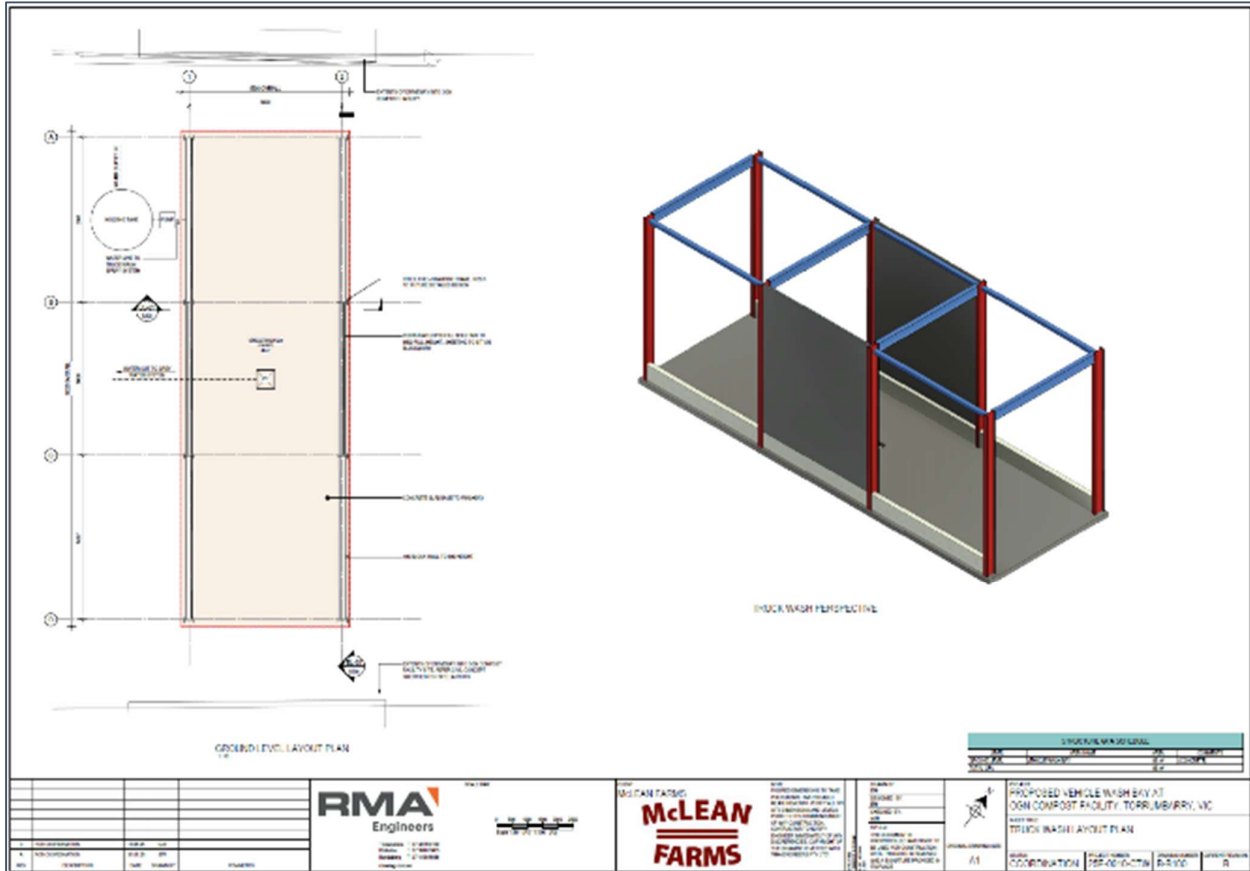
Truck Wash – Ground level plan (RMA Engineers, 2025)
